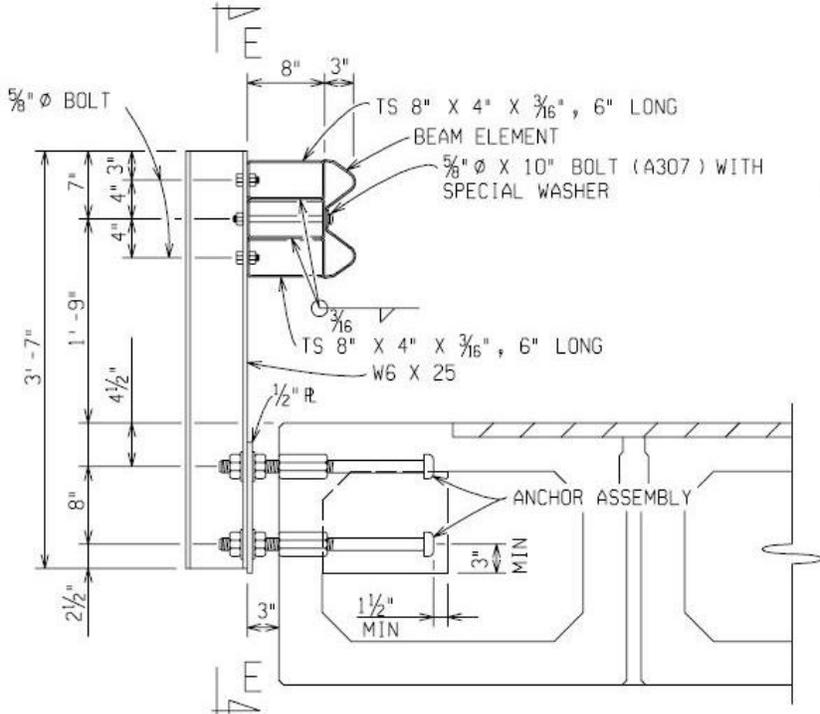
Michigan W-Beam Side-Mounted Rail [24]
